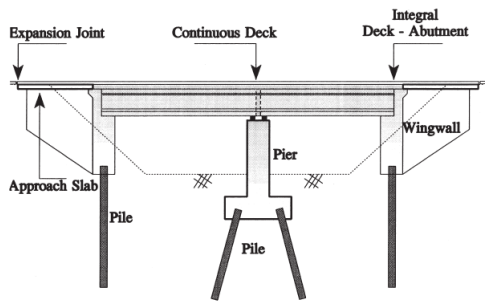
Typical integral abutment bridge with 2-spans [4]
